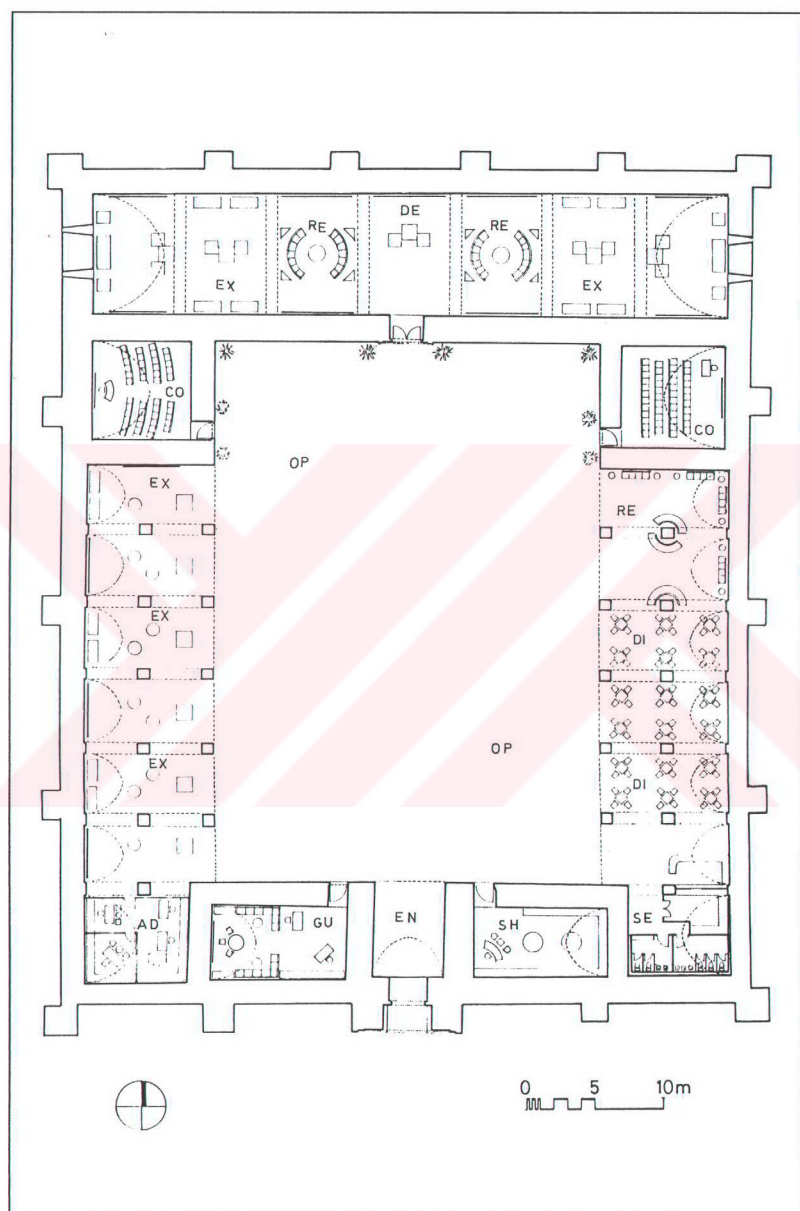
Refunctioning Proposal for Kirkgöz Khan - Plan Drawing
